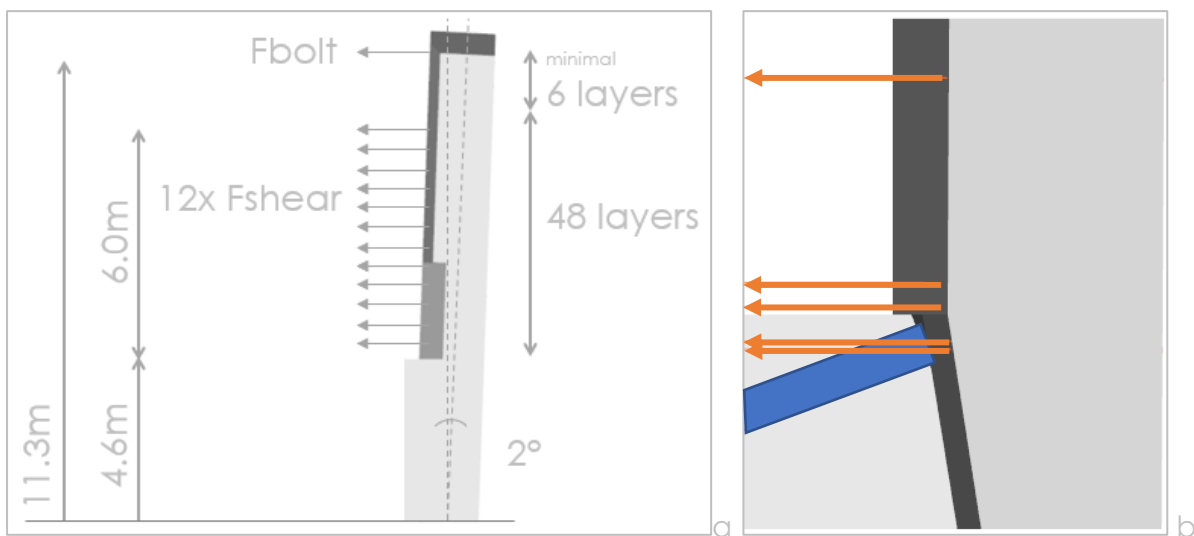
a) Applying a cast glass system with equal capacity as the steel interventions; b) cast glass wall in blue, former steel interventions in orange.
